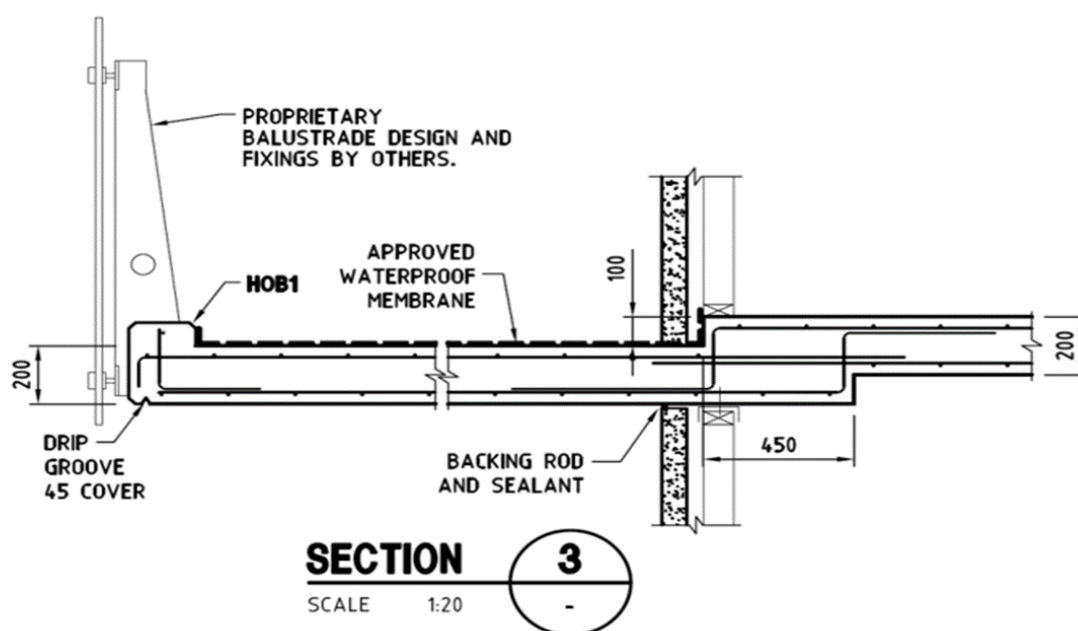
Typical concrete balcony structural construction details (flat slab with set down and no fall)
